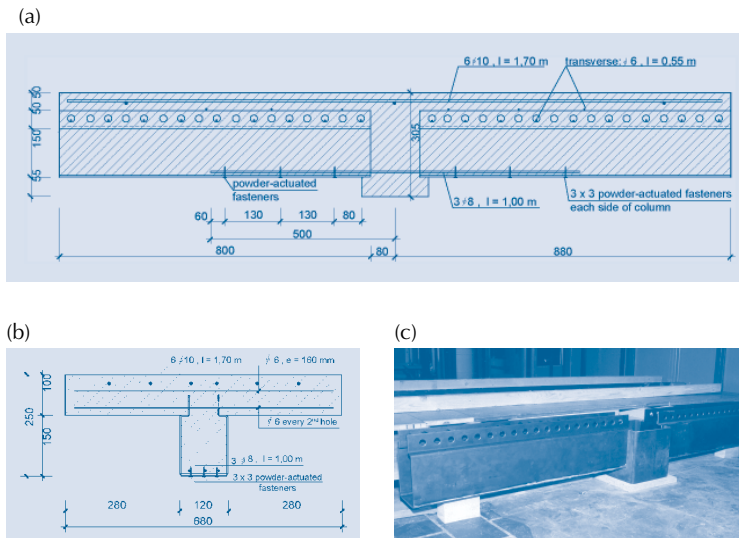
Balanced cantilever beam for ultimate load test in the negative moment region: (a) longitudinal section with support detail (b) horizontal section with reinforcement details, (c) Steel sections before mounting into the formwork
